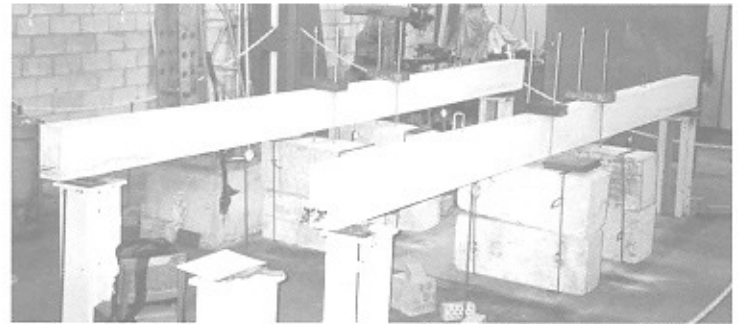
Test set-up to monitor the long-term deflection and cracking behavior of beams prestressed by FRP tendons
